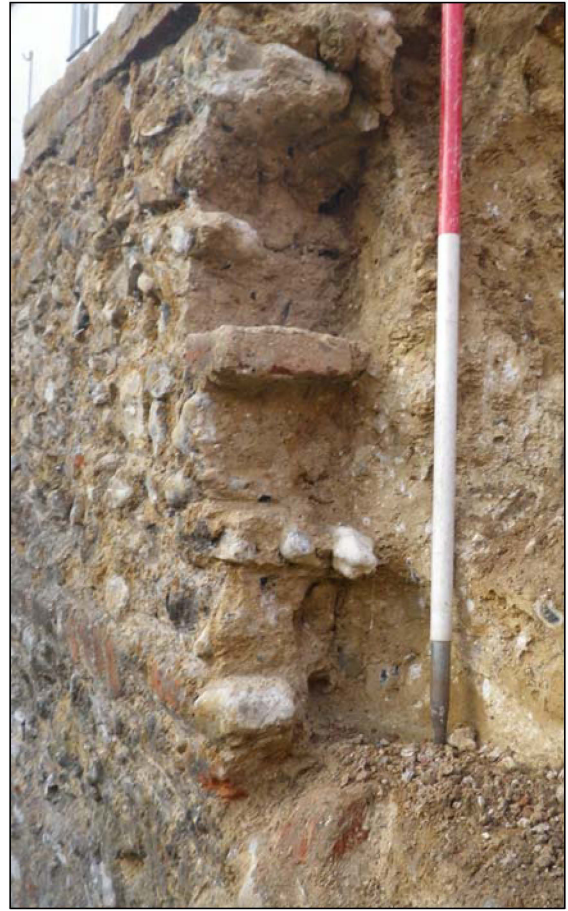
Detail of north wall 0125 fabric, showing brick and flint coursing. The scale bar is 0.5m.
